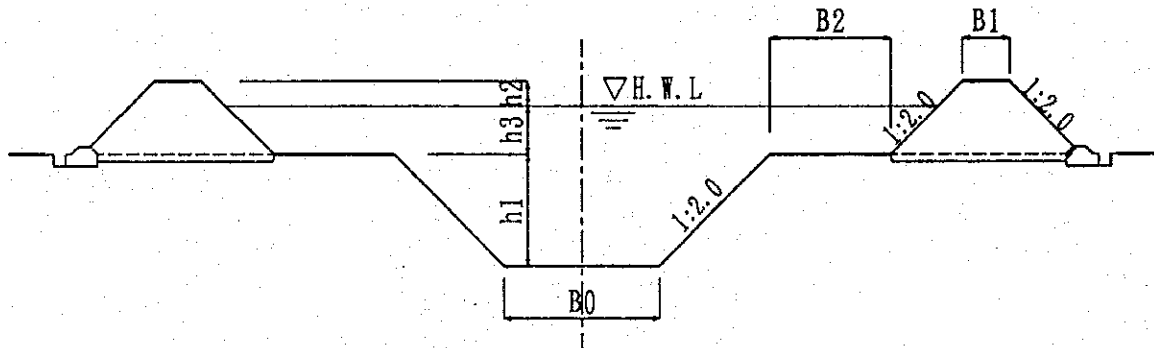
PROPOSED CROSS SECTIONS FOR
